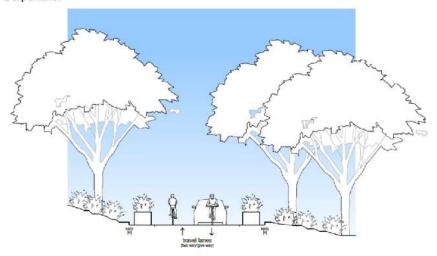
Proposed cross-section for The Serpentine (two-way give way)
